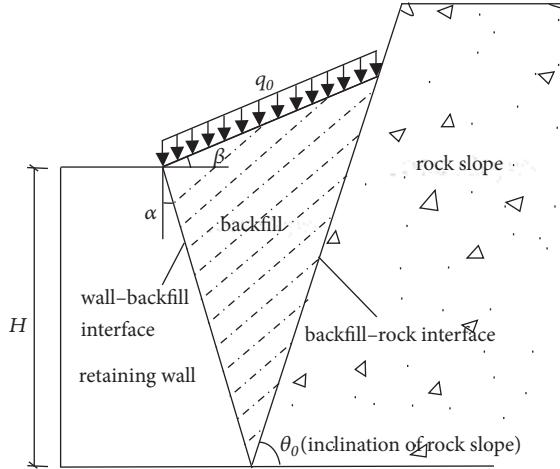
Schematic drawing of a rigid retaining wall near rock slope.
